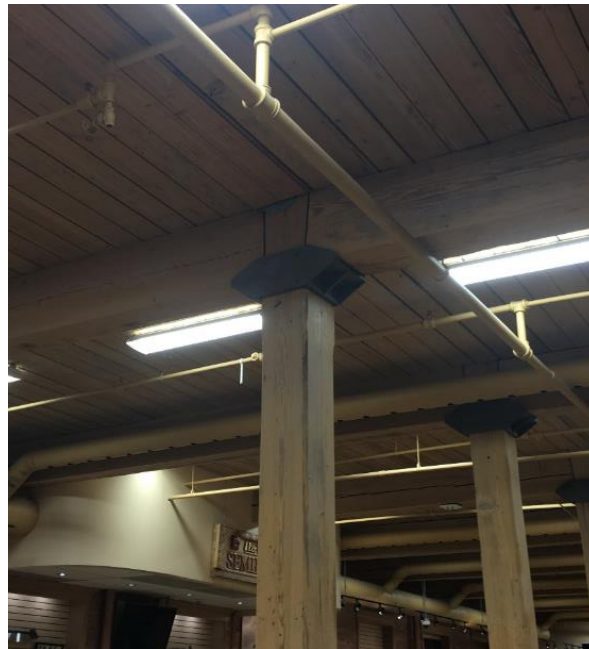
An exposed timber building, constructed in 1902 as a warehouse in Toronto, Canada (author's photo).
